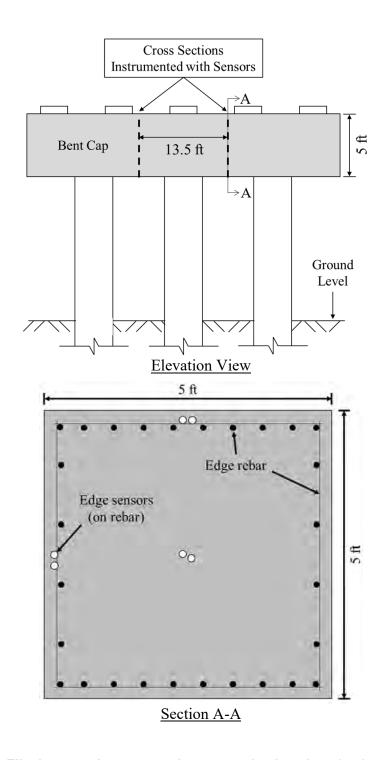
Elba bent cap instrumented cross section locations (top) and temperature sensor locations on these cross sections (bottom)
